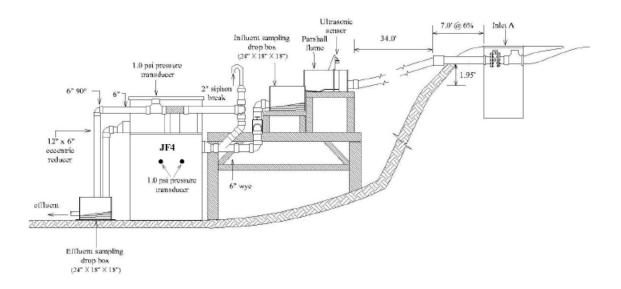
Photo of field test set-up for the Jellyfish<sup>®</sup> Filter JF4-2-1. Below-deck inlet pipe enters the right side of the vessel and outlet pipe (invert at deck level) exits the left side of the vessel. External bypass piping has invert of horizontal section 18 inches above deck level.
